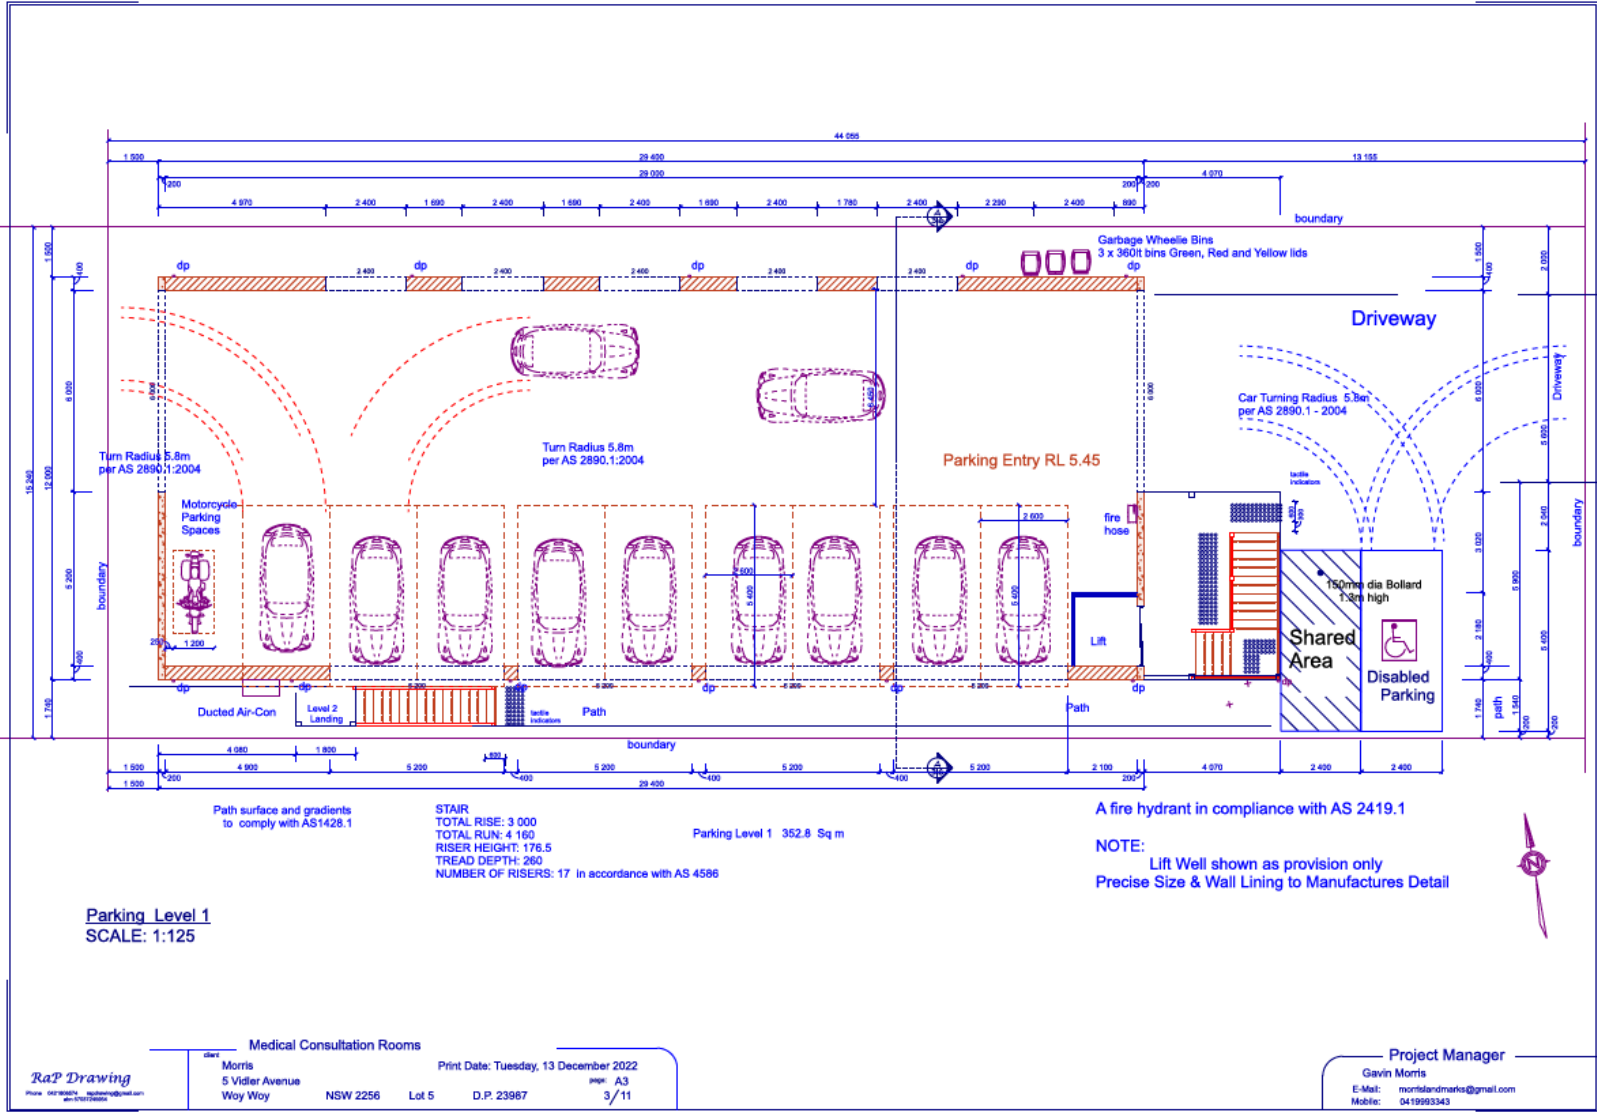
Proposed Ground Floor Plan (Source: Rap Drawing, 2022)
